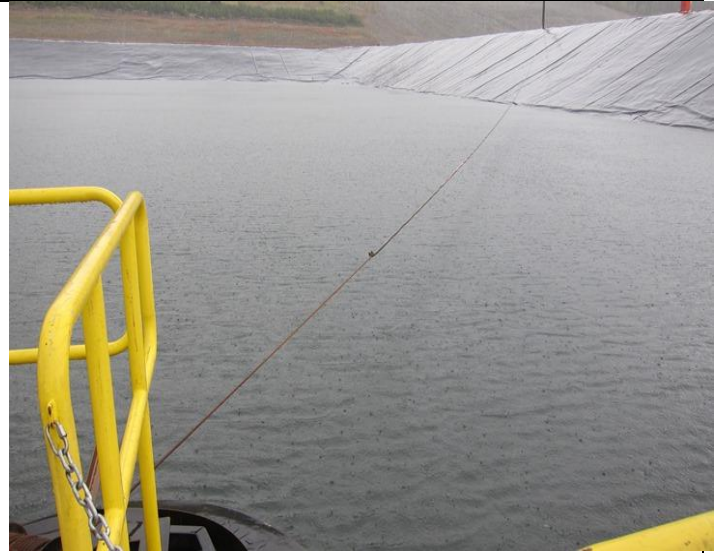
Looking at north-east corner of TSF from Barge, with only one-cable attached at north side of barge.
